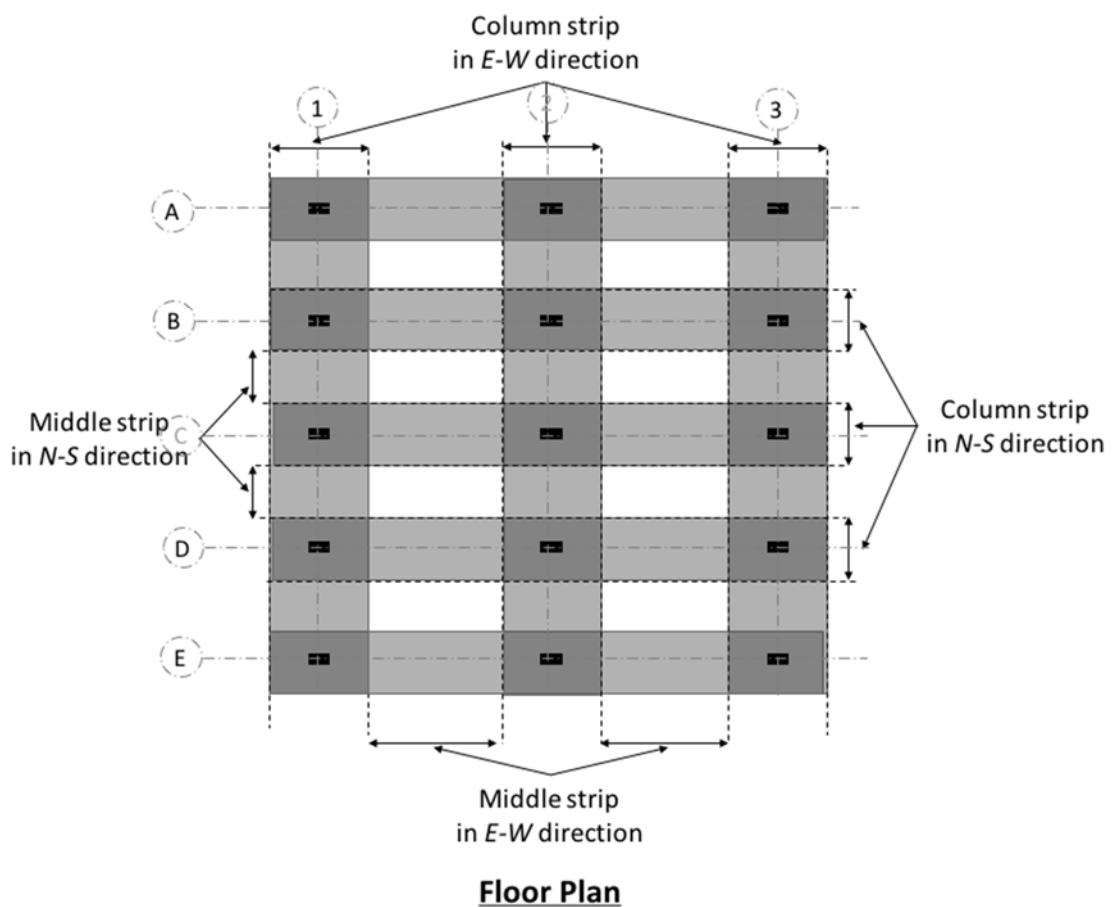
6 – Flat plate floor plan showing column strips and middle strips in both directions
